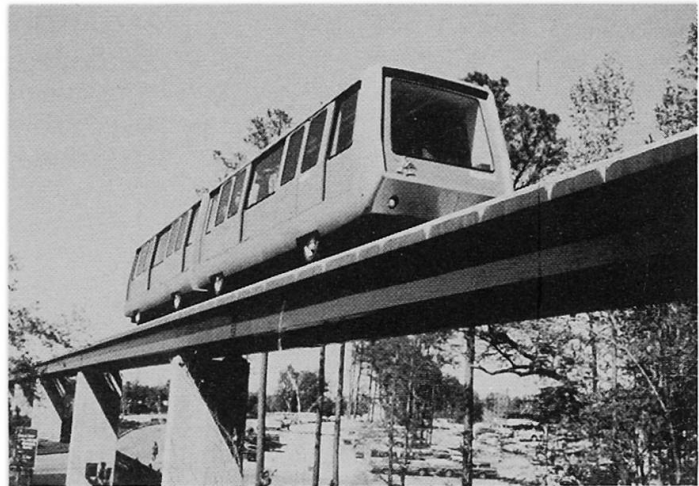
The Dallas-Fort Worth Airport uses a precast concrete box girder with side walls to support the transit vehicle. The vehicle steers off the top of the concrete wall. (Photo by author)
